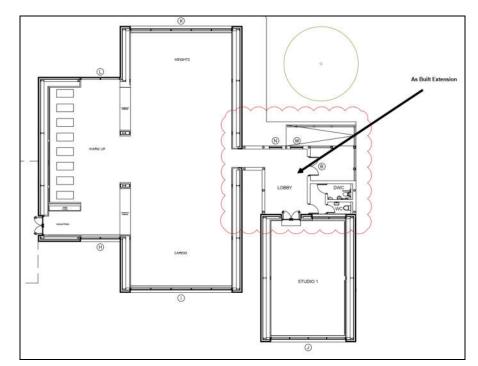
As Built Gym Floor Plan - 16/02572/NMA
